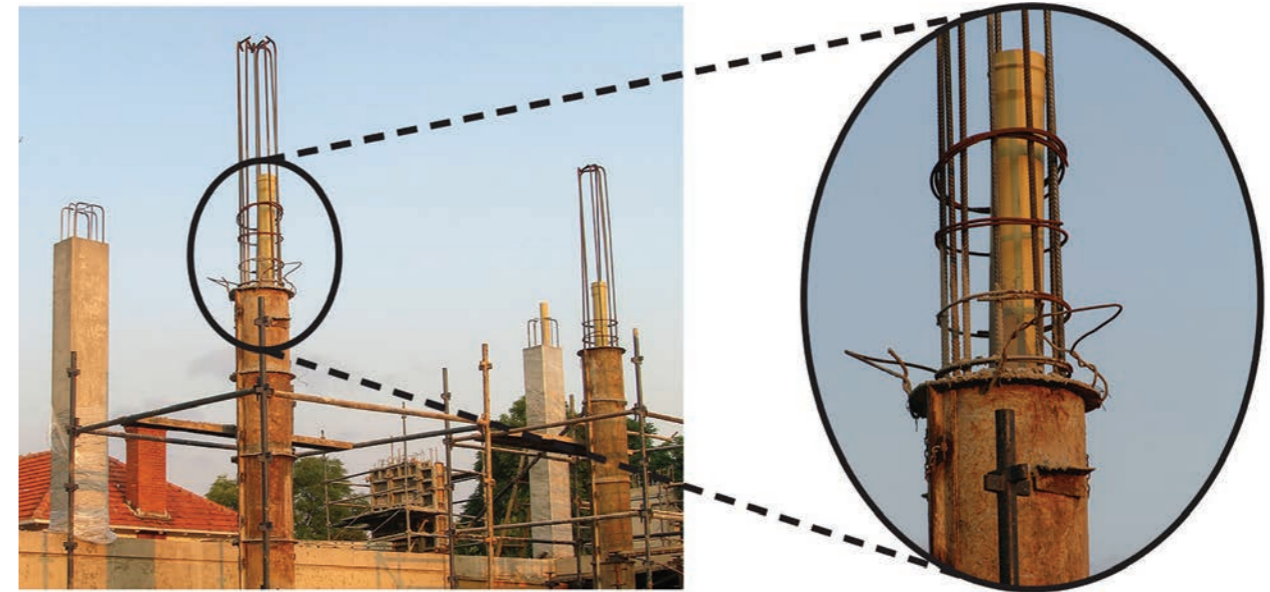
Steel reinforcement is placed inside a concrete pillar of a big building.
